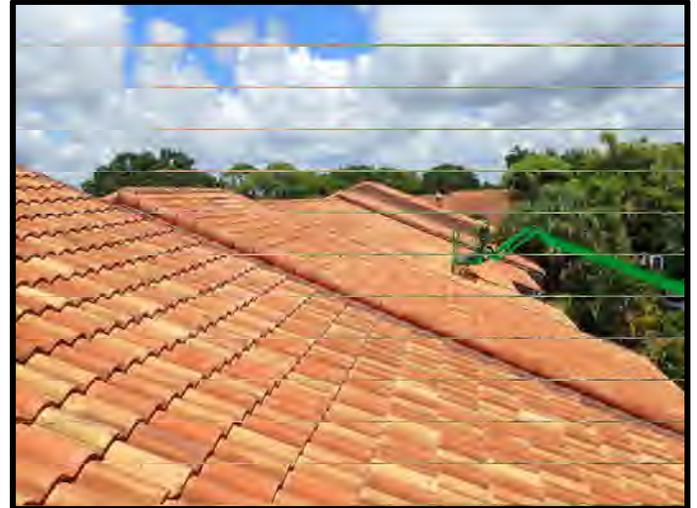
Cracked piece of concrete roof tile remaining on the surface of the roof.
